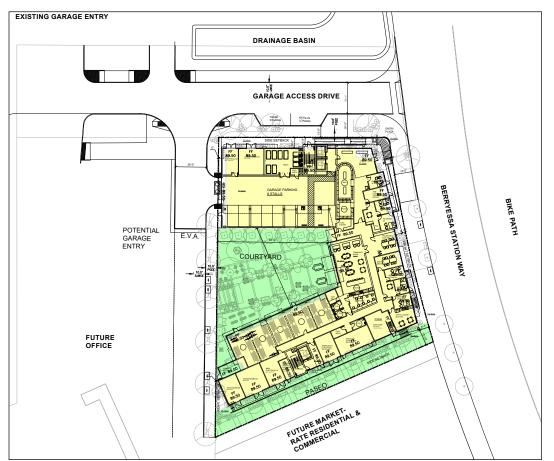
Berryessa Station TOD Site Plan (Phase 1)
